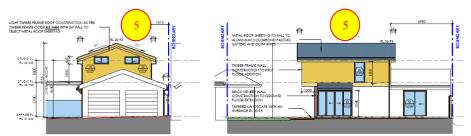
Garage Elevations - DWG 14 Rev B (Source: DS407 Design Studio)
